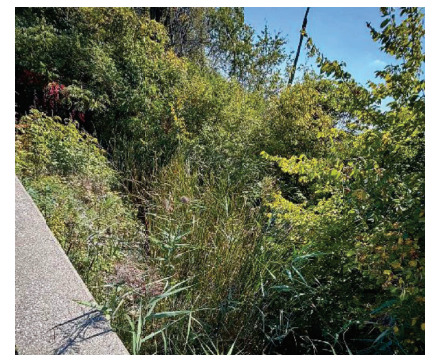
Culvert outlet of Crossing 6, north side of County Road 46.
